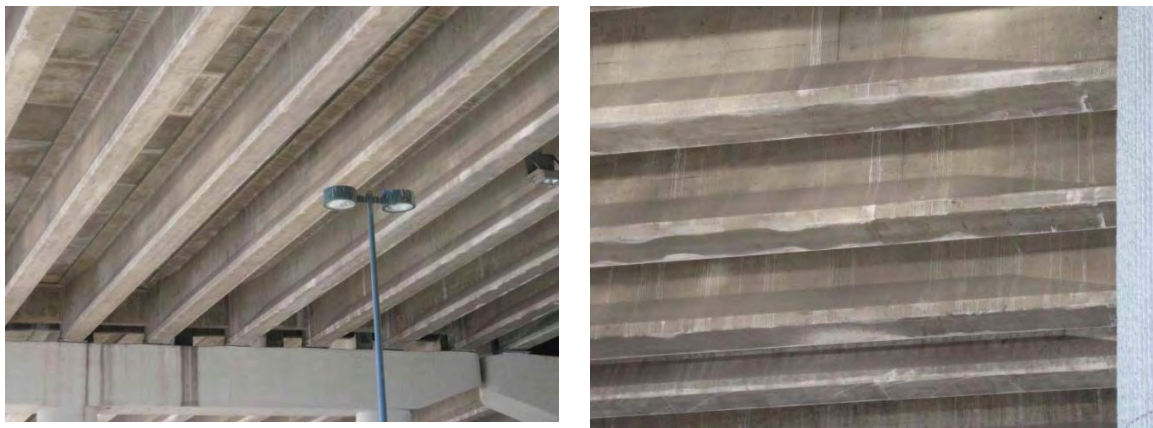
Pigeon feces in Gir 5A where pigeons entered through 3-inch gap.
